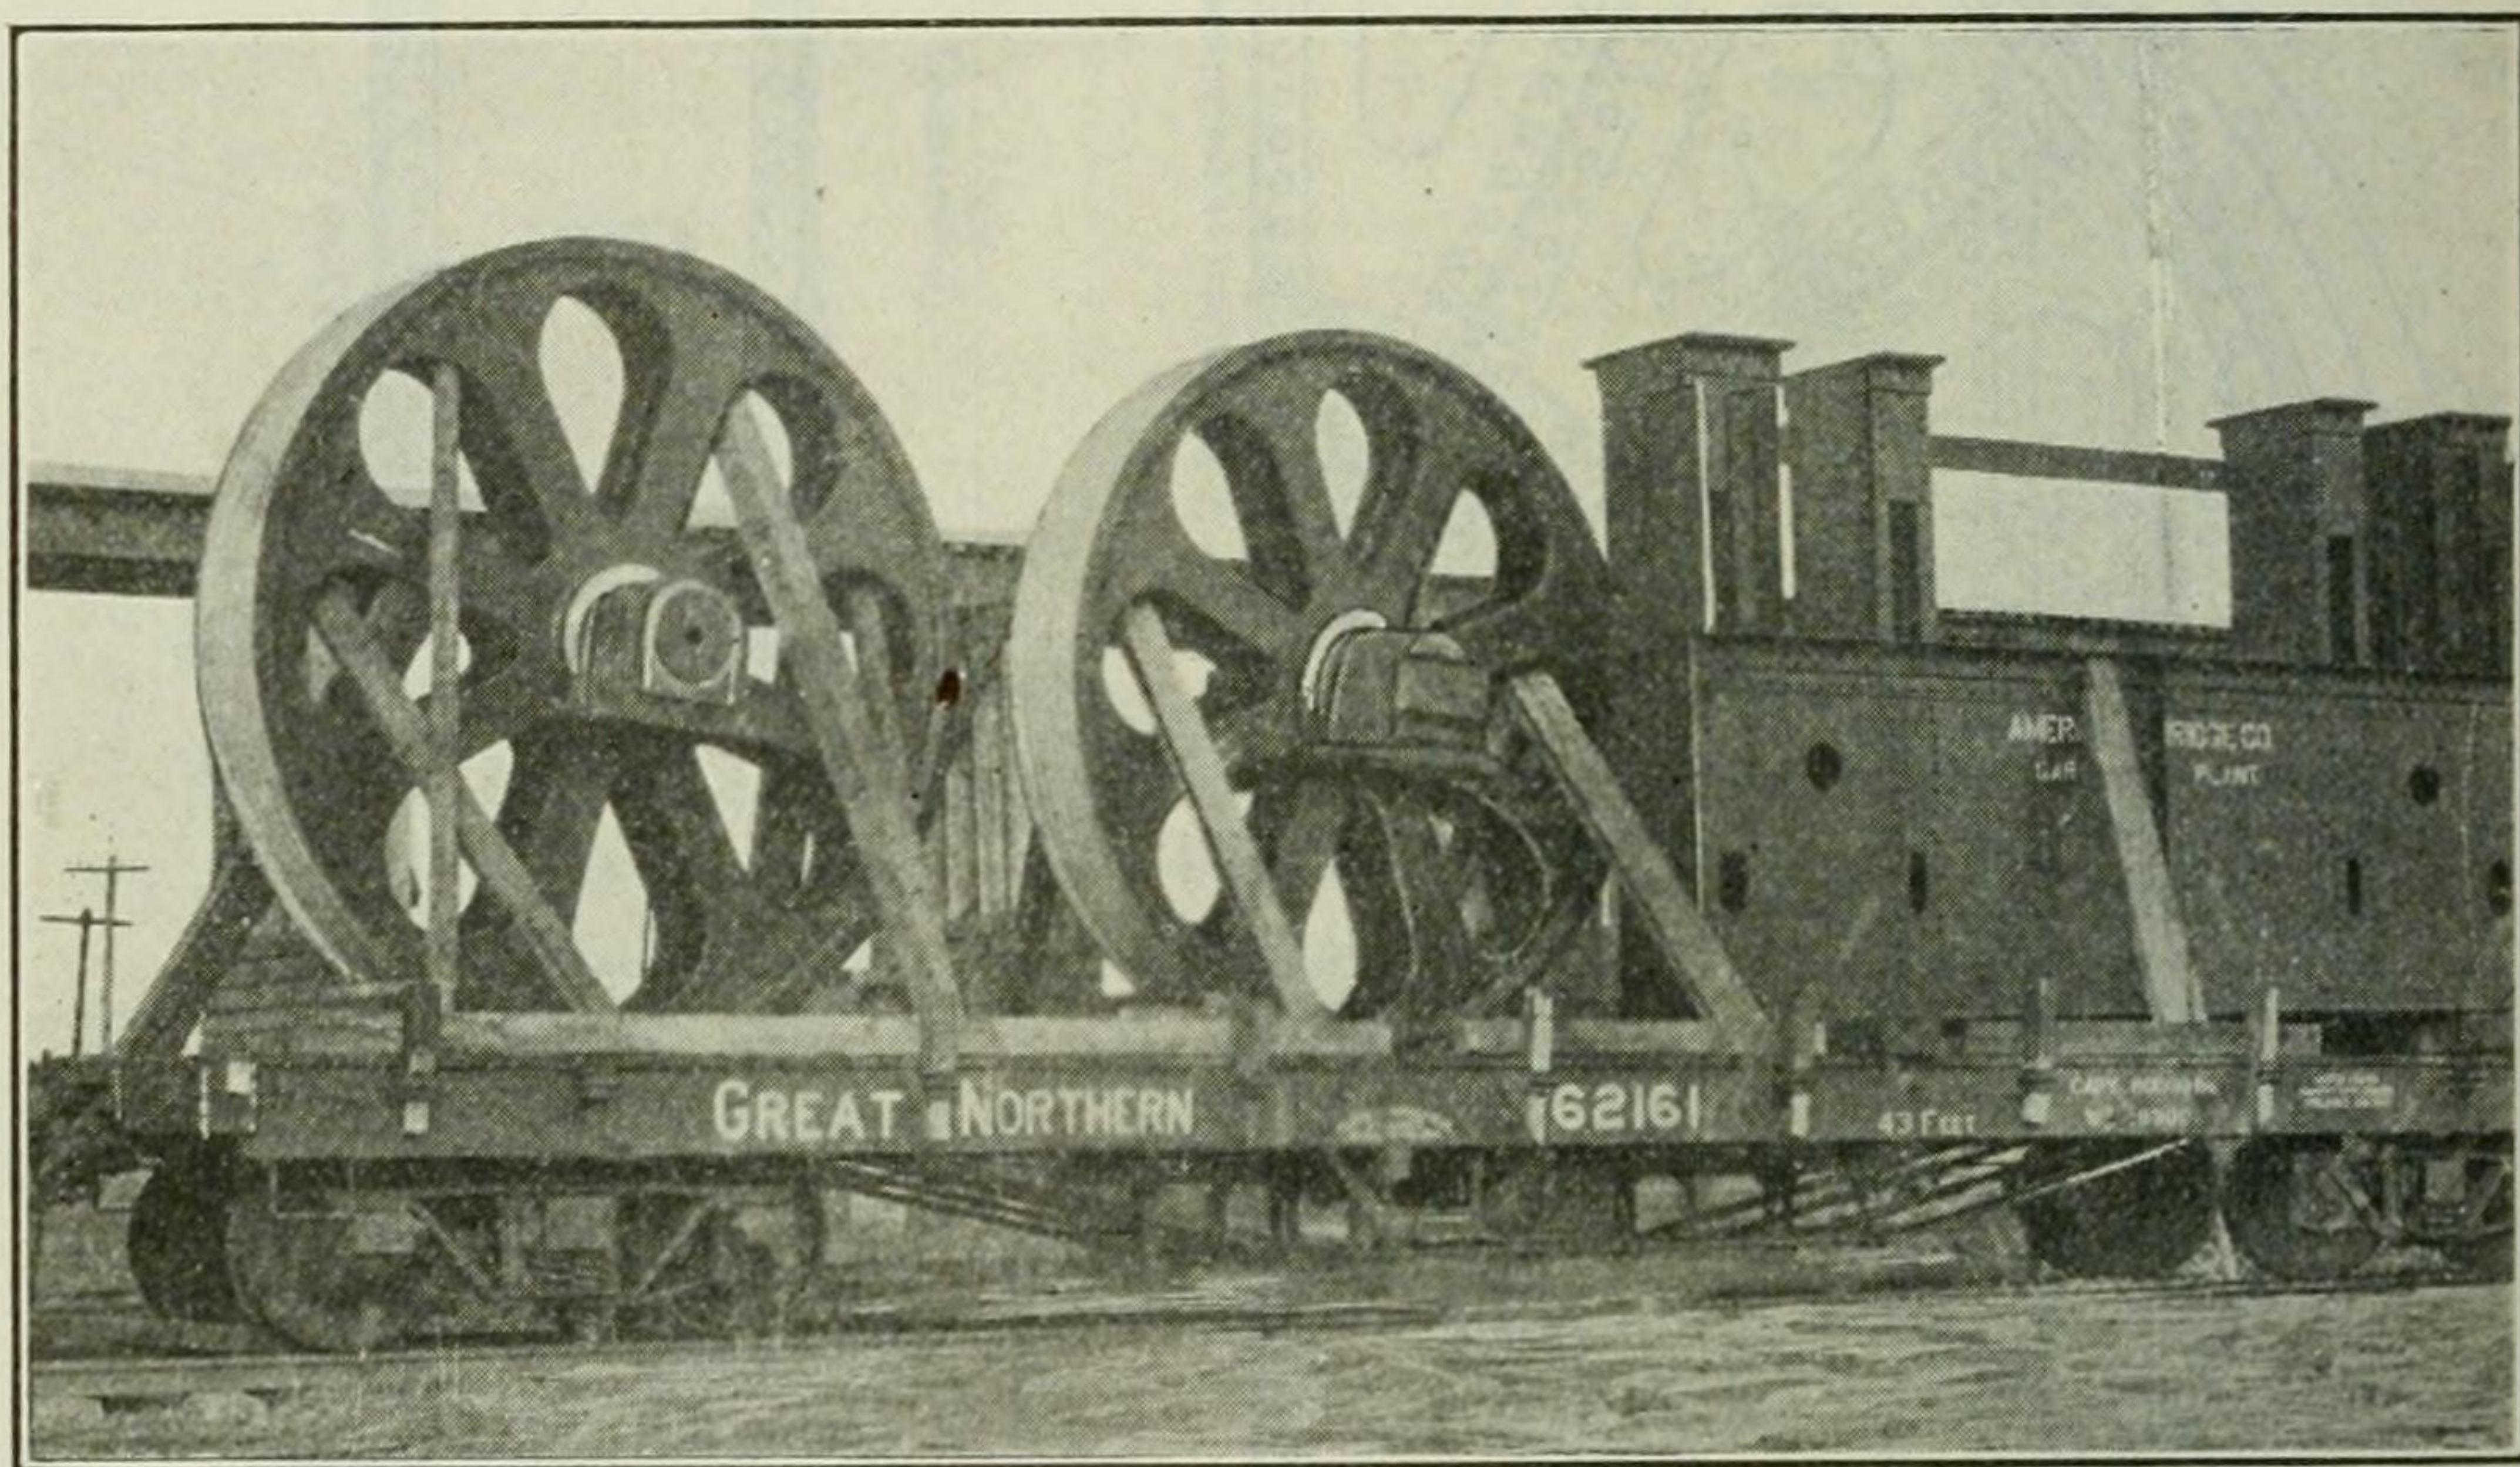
TWO 12-FT. CAST-STEEL SHEAVES AND SUPPORTING GIRDER OF MISSOURI RIVER BRIDGE AT MONDAK, MONT.
